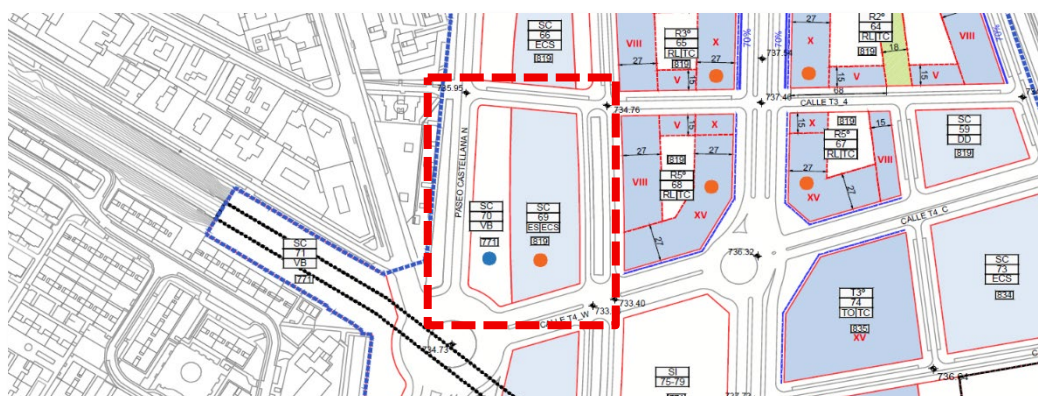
Urban plan for new construction site with Plots 69 and 70.
